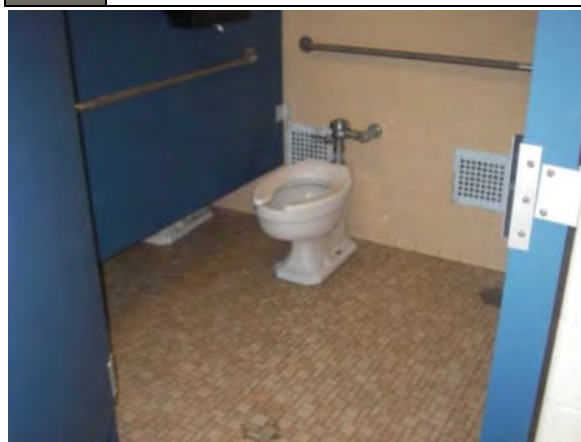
1902 BUILDING BOY'S RESTROOM HANDICAP TOILET
